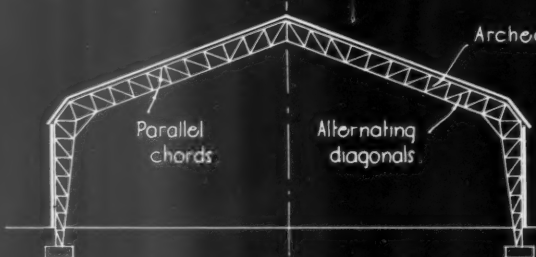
FRAMED LATTICED CONSTRUCTION
